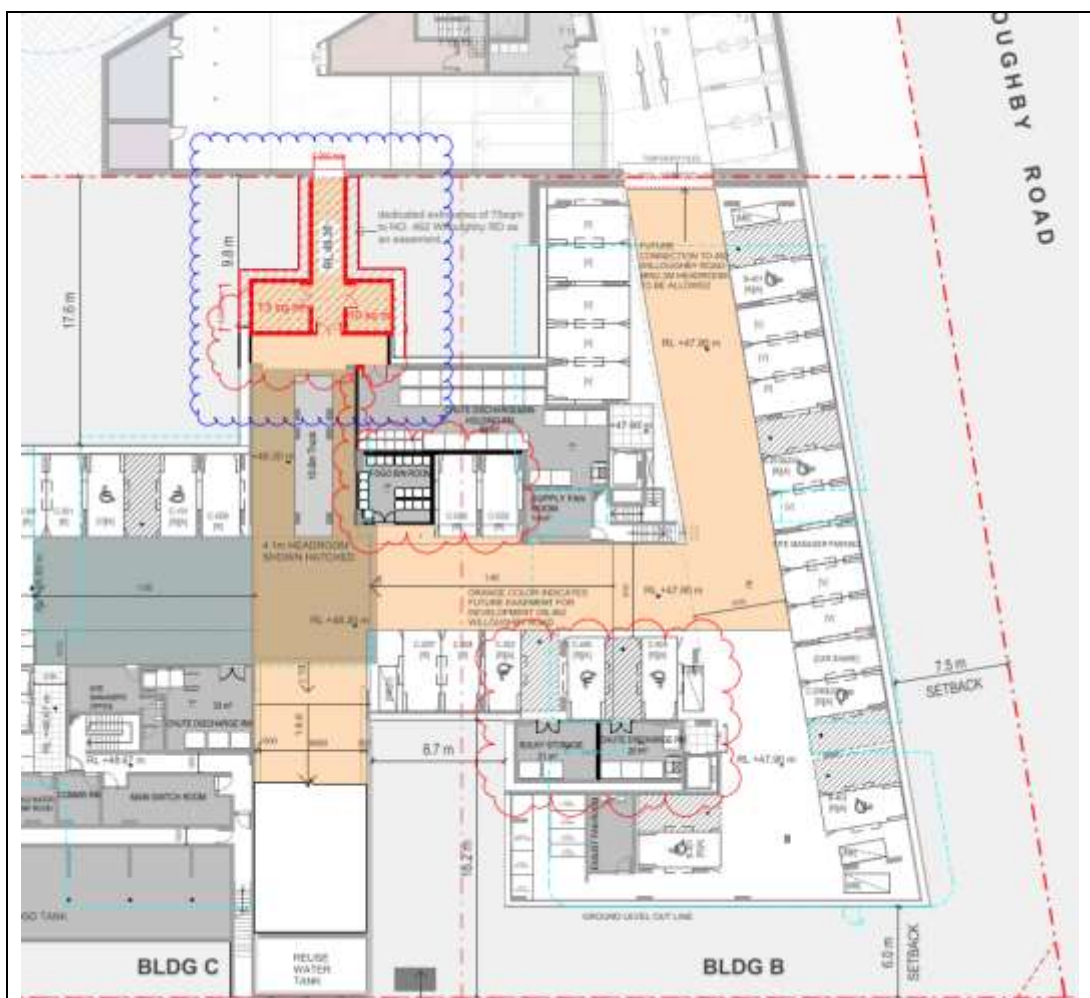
A notional, extended proposed right of way to provide for a 22.5m² holding room and tunnel serving 462 Willoughby Road (source: Drawing A.102/ST1 Rev E)
